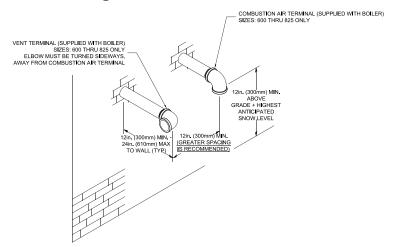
B: Direct Vent - Sidewall Elbow Terminations, Size 600 through 800 Only
